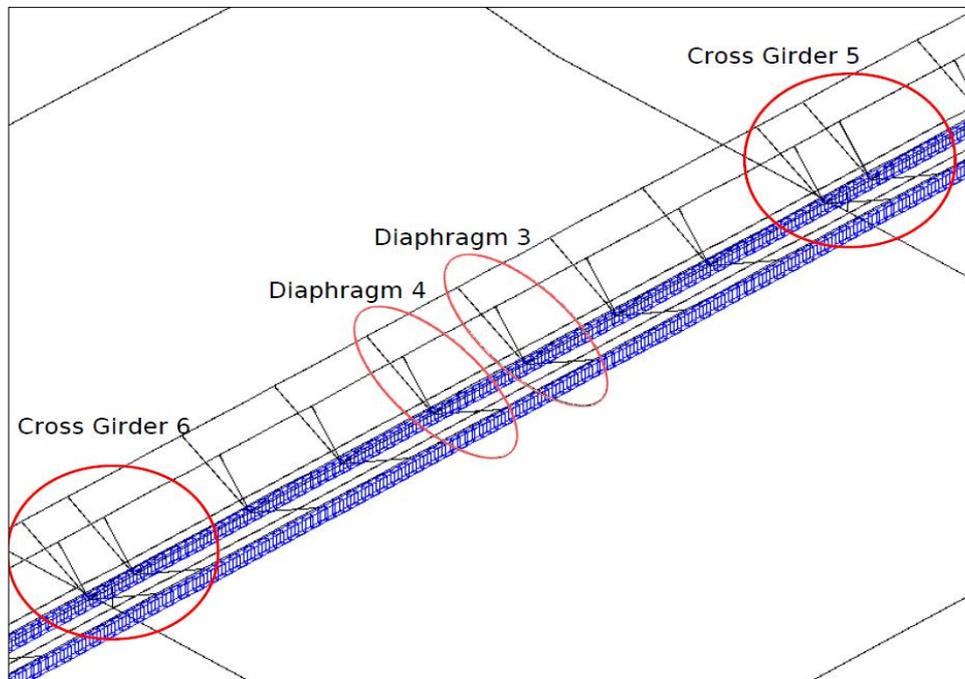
Local analyses are performed on the railway girder across cross girders 5 and 6 and diaphragms 3, 4.
